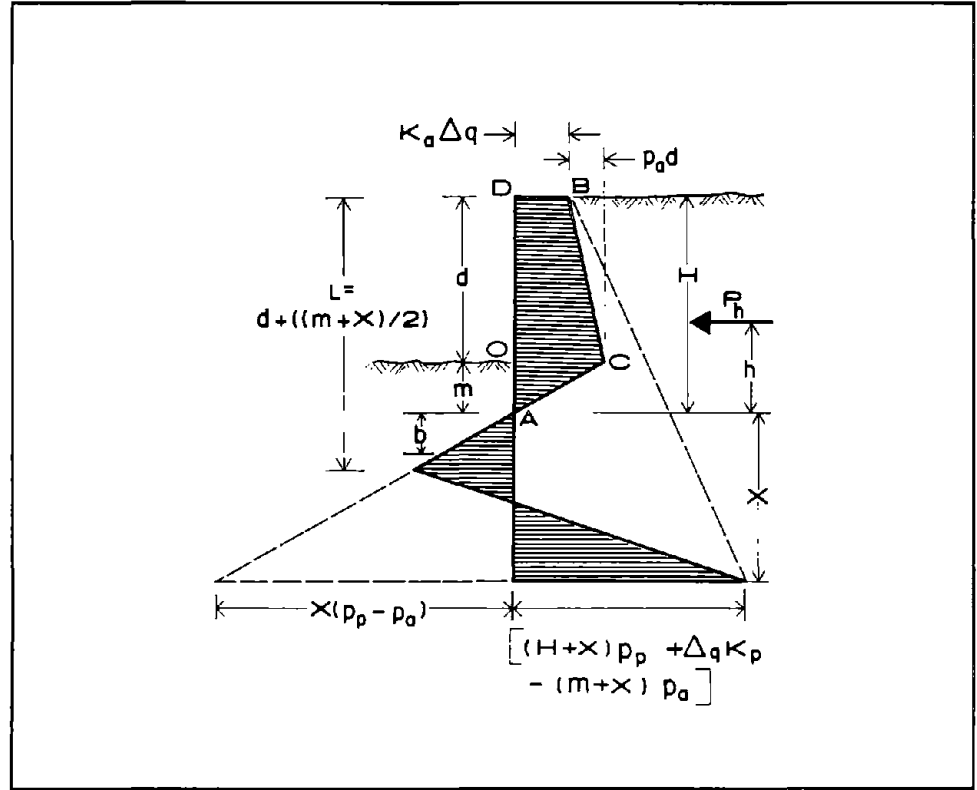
Earth pressure distribution cantilever sheet pile wall—uniform surcharge.
